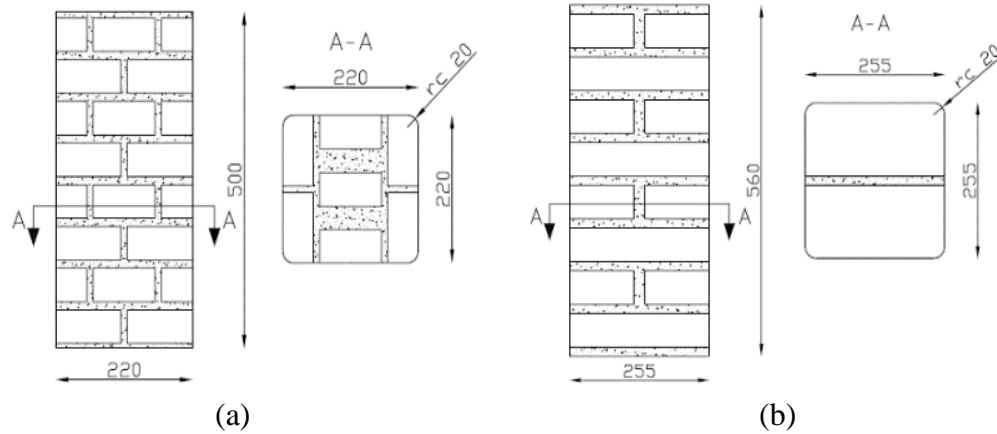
Column Cross-section, (a) Tuff Unit Columns, (b) Clay Brick Columns
